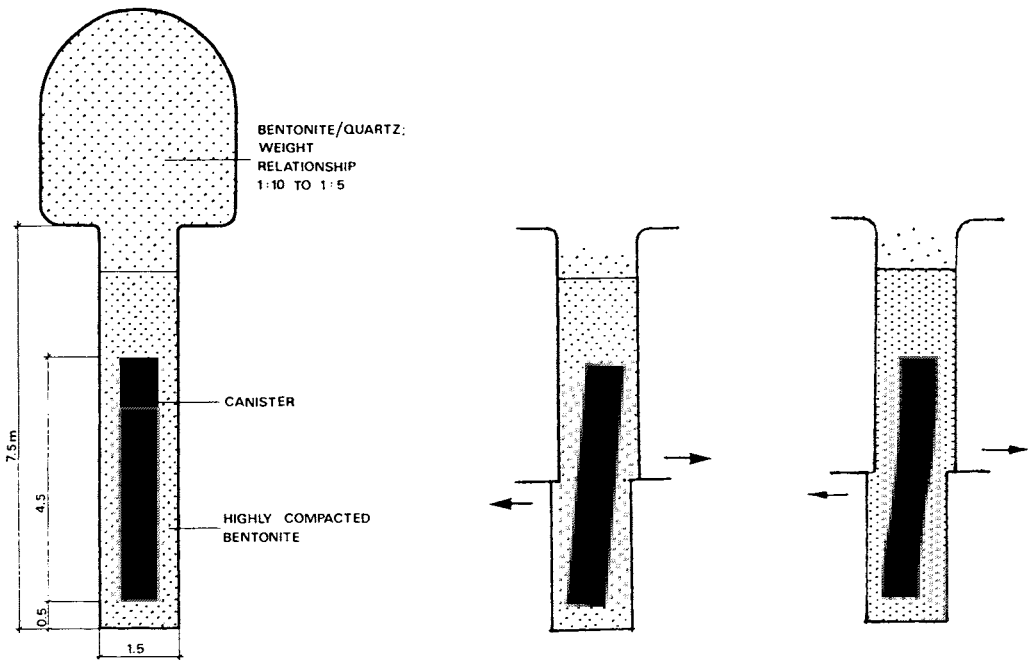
Shearing of canister along major fracture passing through a deposition hole in a Swedish KBS3 repository
